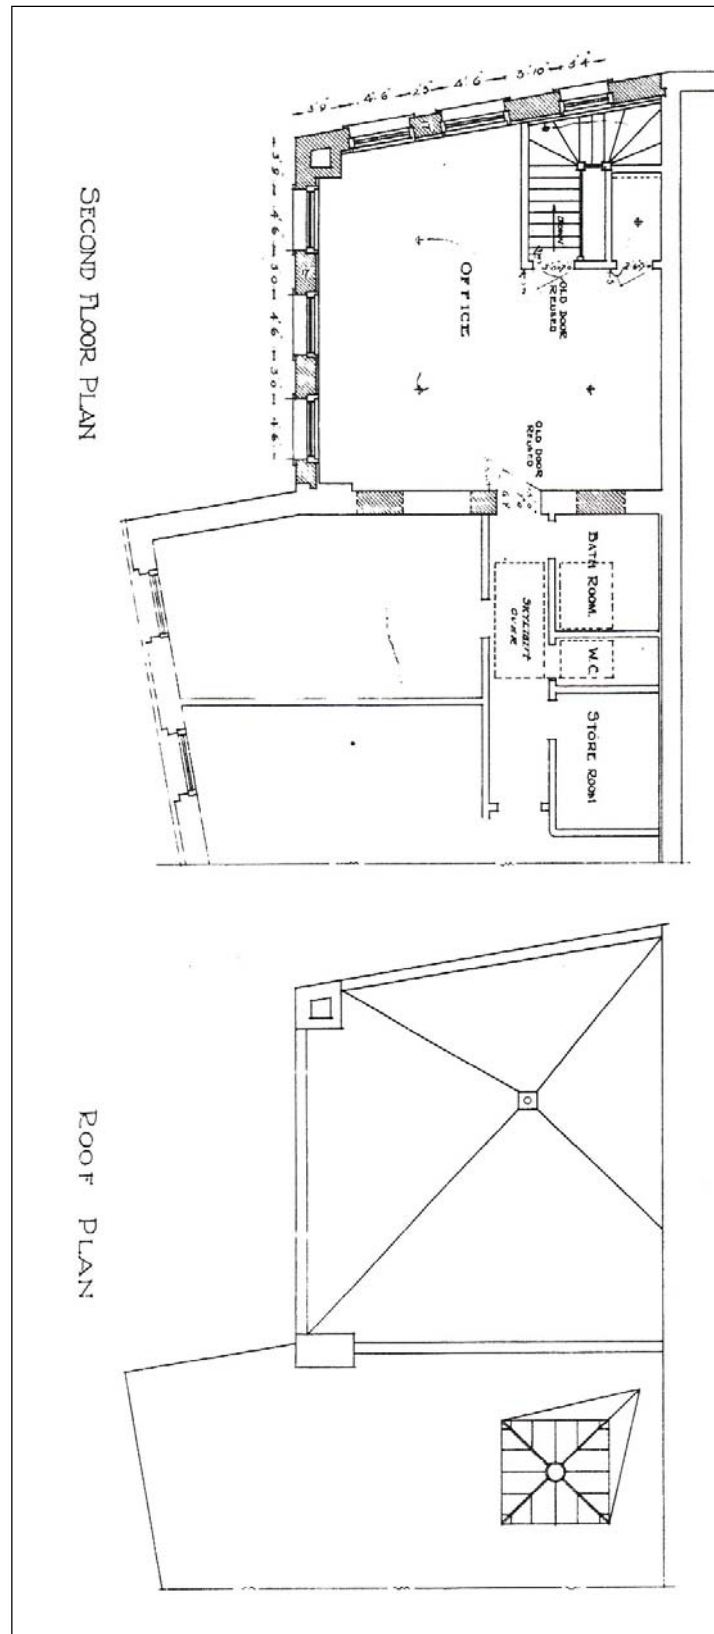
Architect’s Plans, “Second Floor Plan” and “Roof Plan,” 1911. (Courtesy of the City of Winnipeg Archives, Plan #808/1911.)
